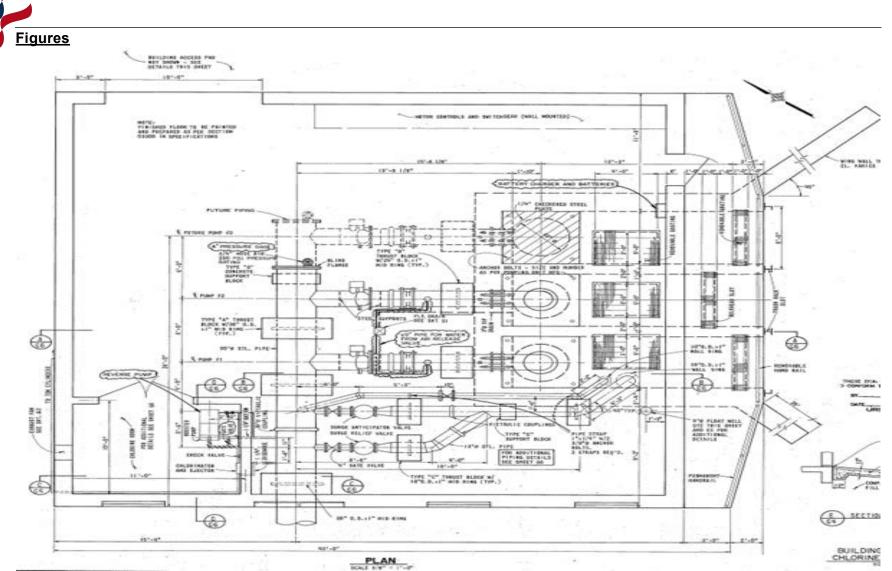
Plan Drawing of GBRA Calhoun Canal Pump Lift Station
